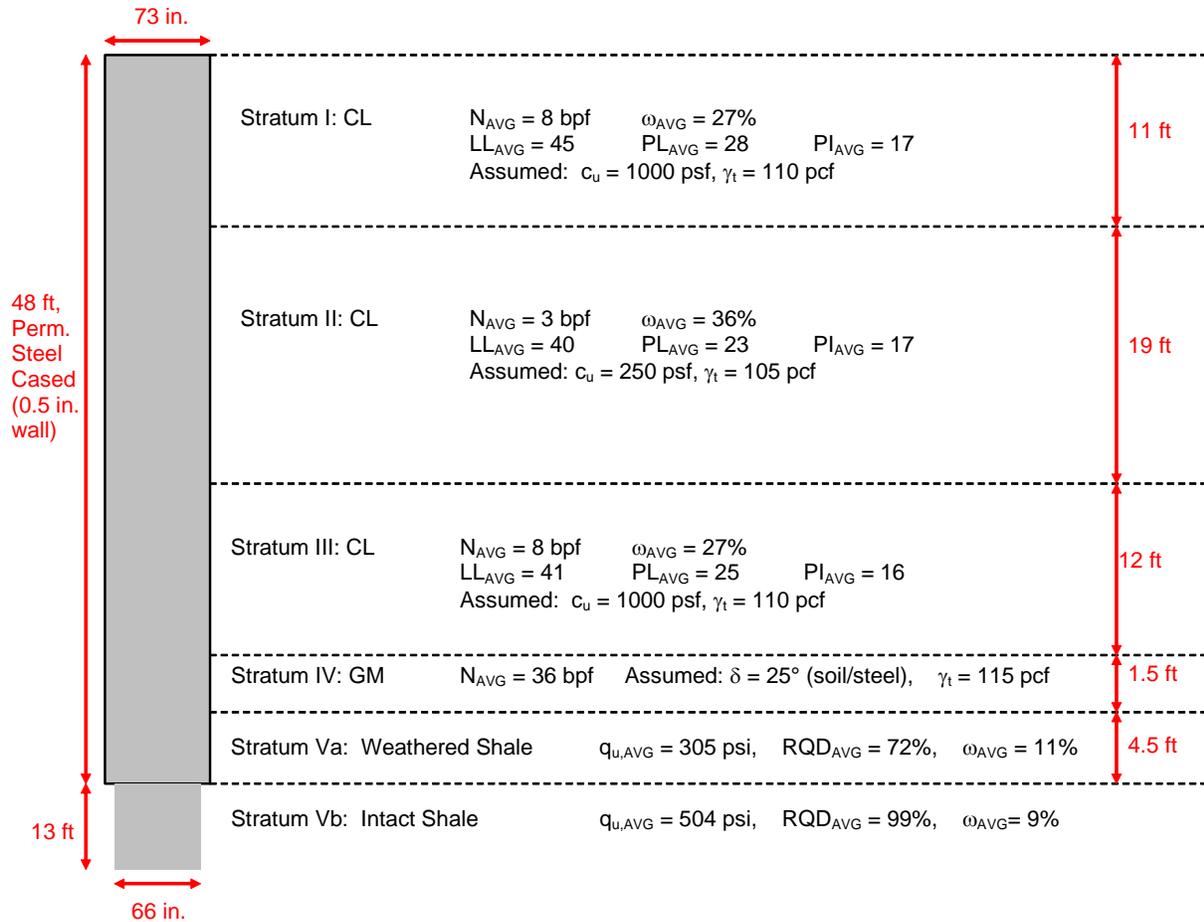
Conceptual cross-section showing various soil and rock strata and associated properties.
